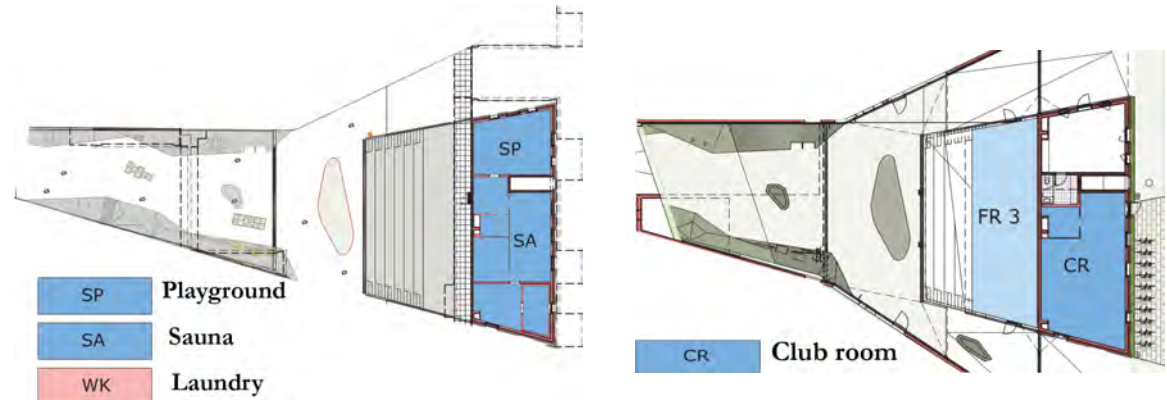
Common rooms and facilities on the ground floor (right) and on the 1st floor (left).
